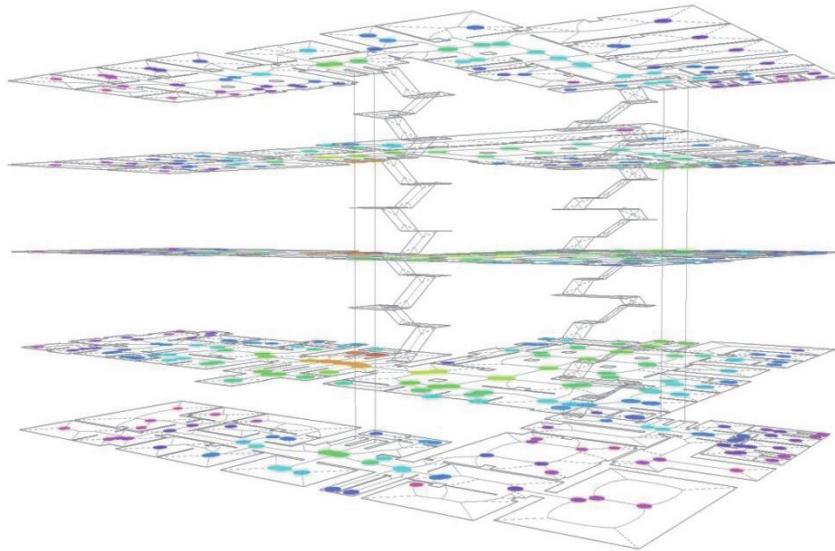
STG, 2012: multi-layered building layout with connecting structural skeleton running through stairwells and lifts on the RIBS case study object
